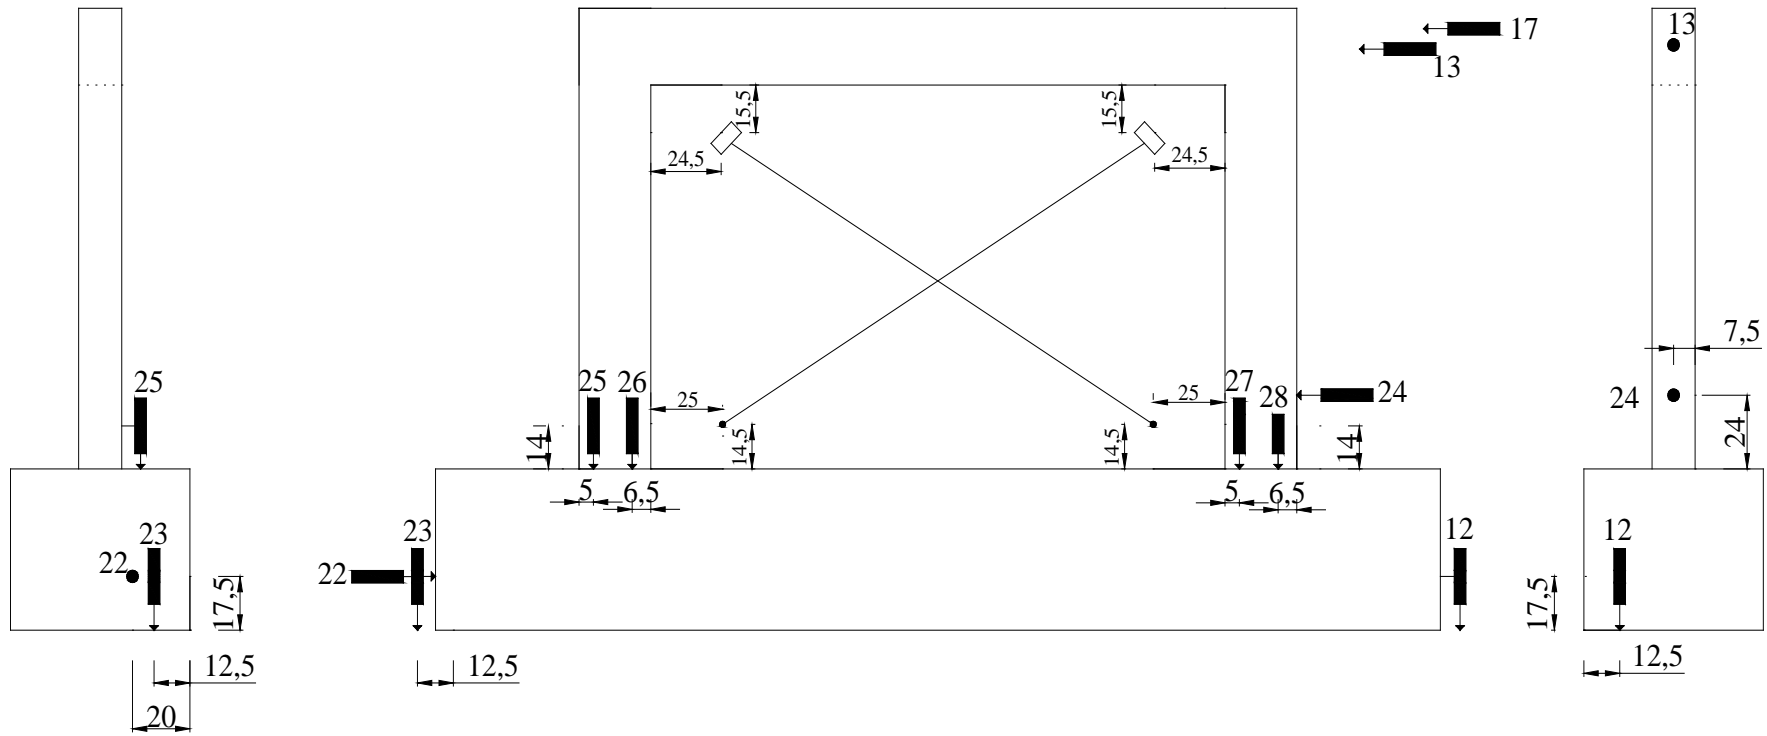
LVDT and string pot placement for specimen 2 and 3 (units are cm.)
